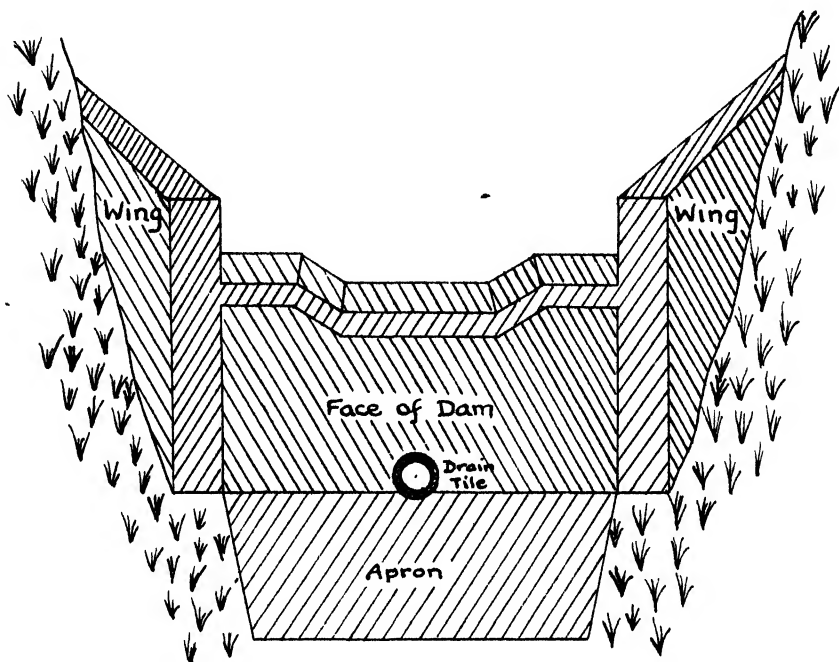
Concrete dam across gully, with spillway, wings, apron and drain tile.
